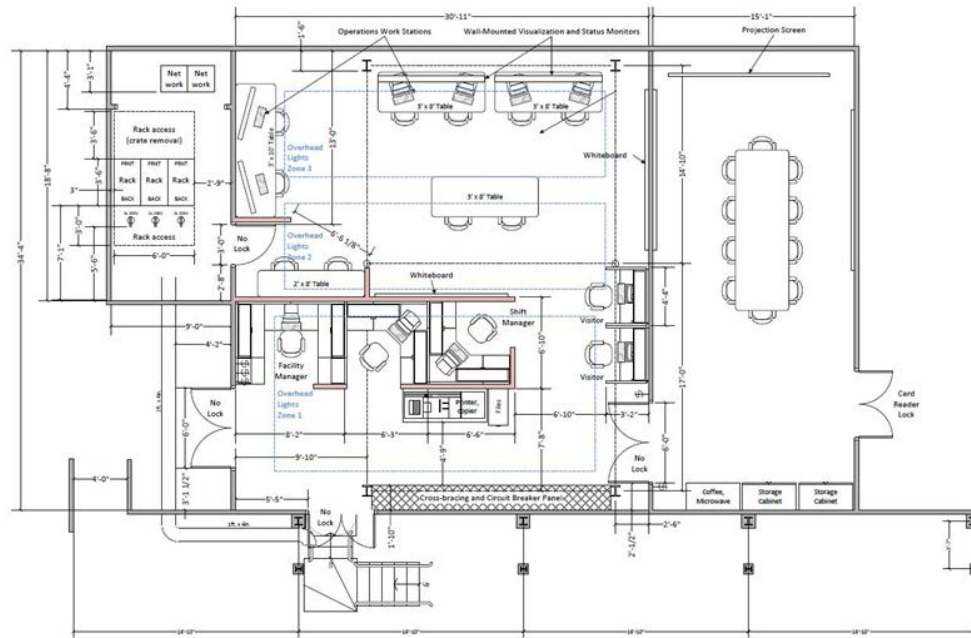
Ref. [6] LSST Camera Control Room at SLAC (Plan)
